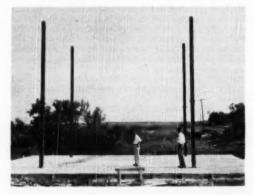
SECOND-FLOOR REINFORCED-CONCRETE SLAB LAID ON TOP OF BASE SLAB IN EXPERIMENTAL BUILDING AT INSTITUTE OF IN-VENTIVE RESEARCH, SAN ANTONIO, TEXAS
